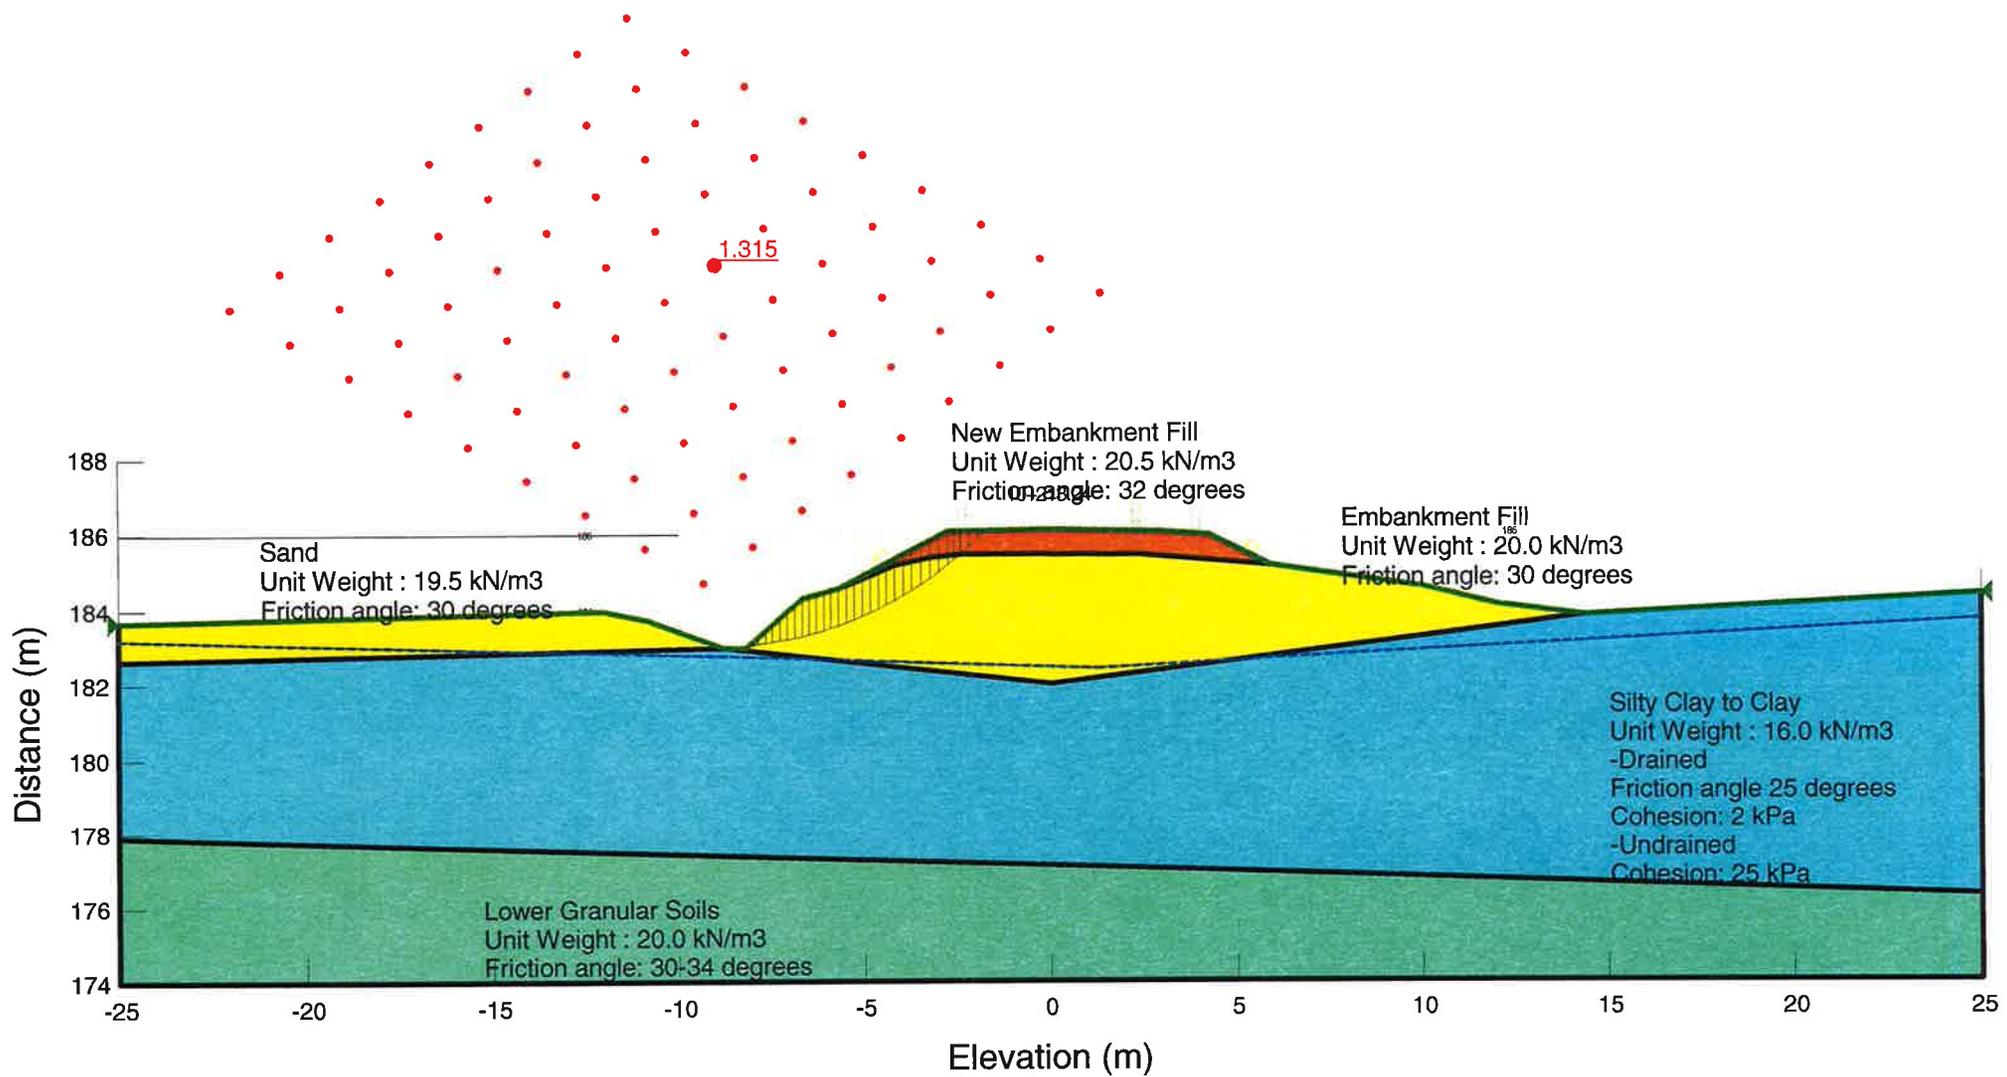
Stability analysis @ STA. 10+213 (south abutment location) for prefabricated bridge option
